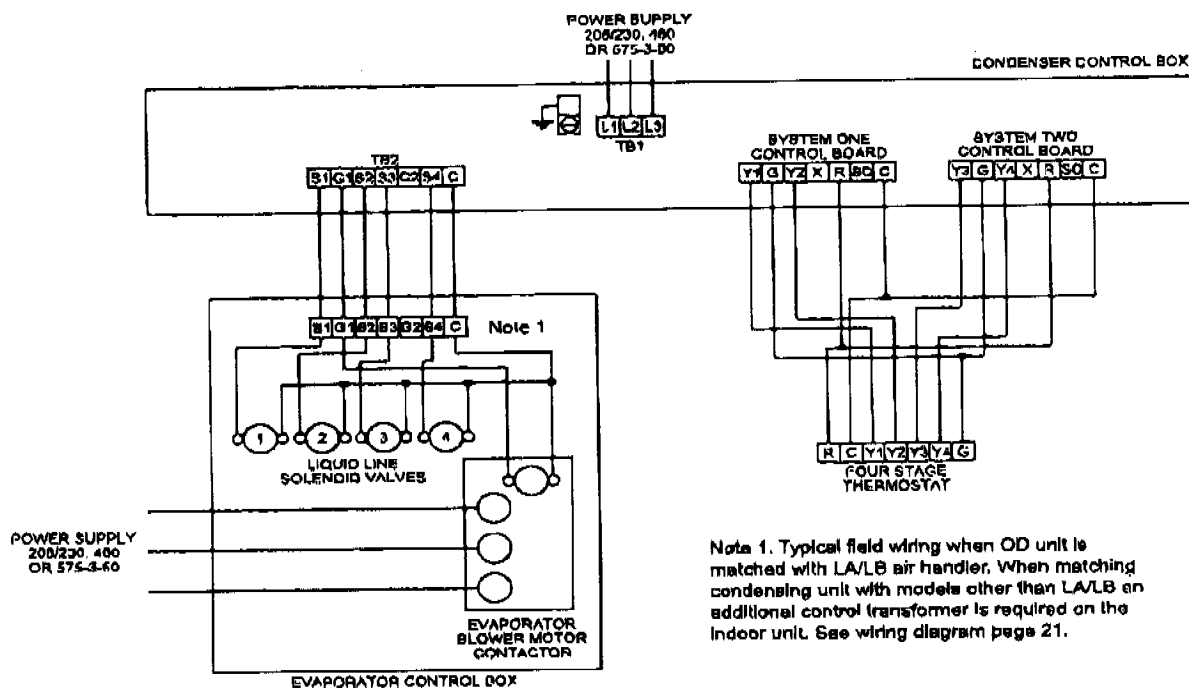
TYPICAL FIELD WIRING FOR HB360, 480, 600 & LB360, 480, 600
